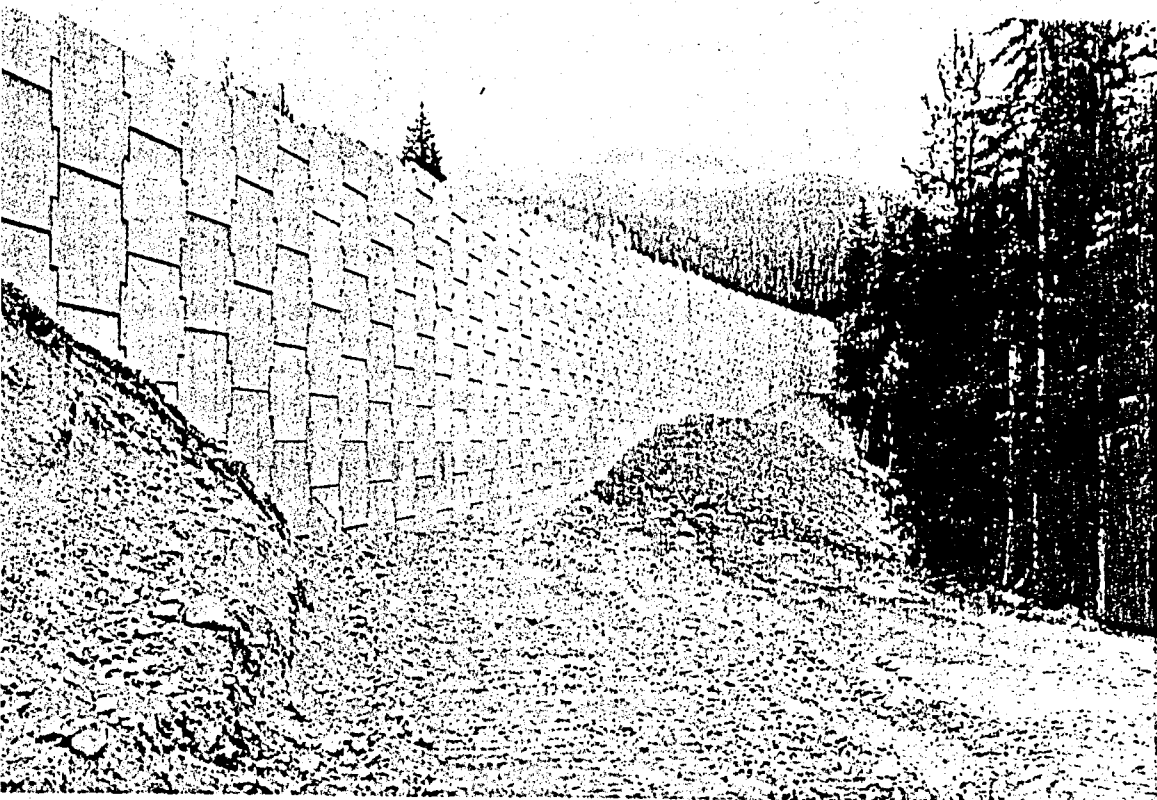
Schematic view of a Reinforced Earth Wall
